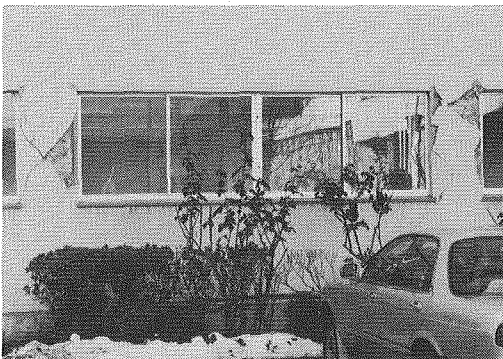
Severe shear cracks in columns of Chiba-gakuen High School.
